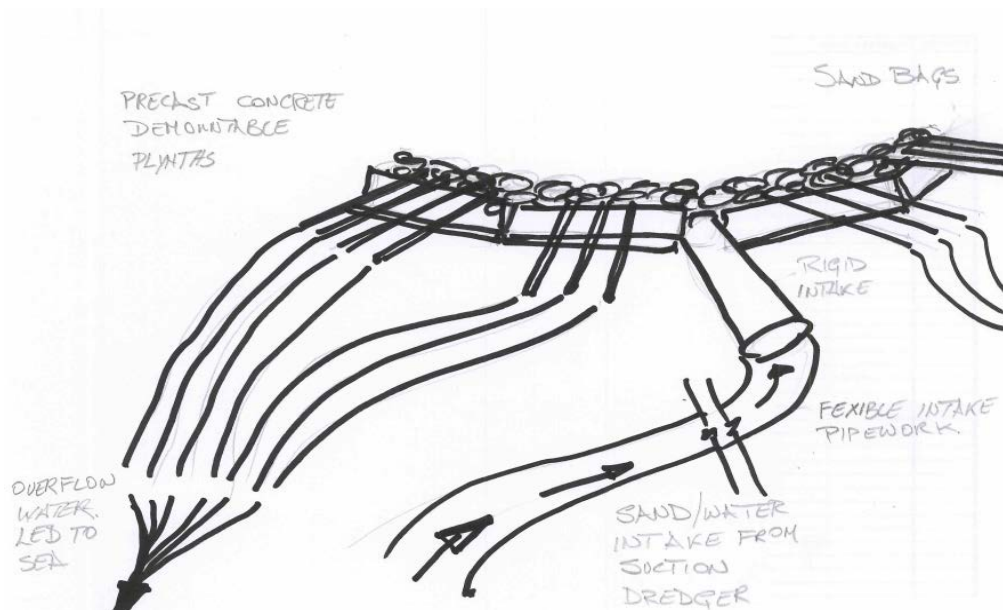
Sketch showing the creation of a sand pit which allows for the pumping of sand and overflow of water. The sand pit structure will be removed once sand replenishment will have been completed
